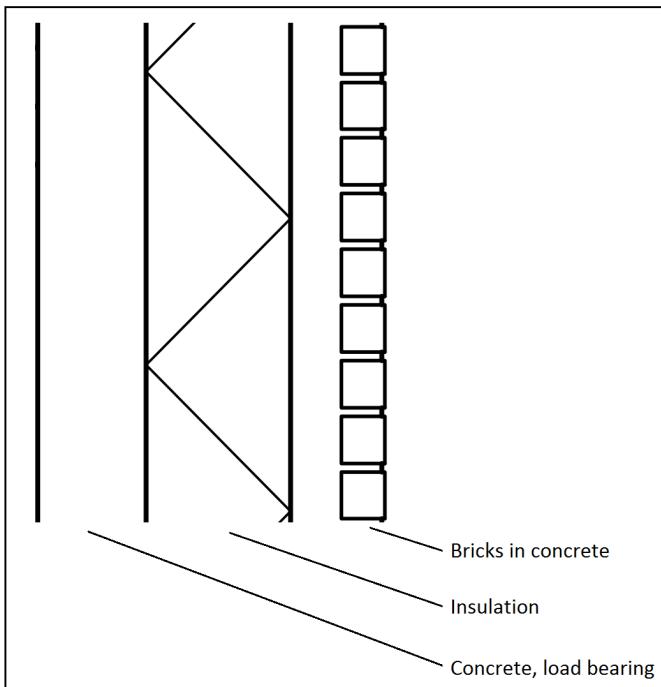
Section of a new sandwich element with remounted bricks (Strängbetong, 2016).
